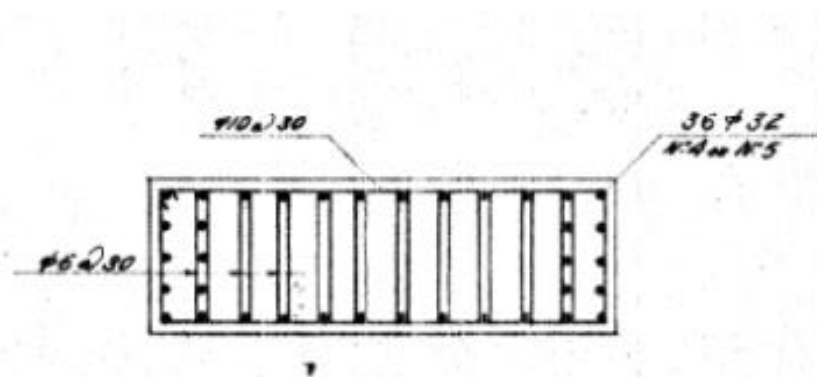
Reinforcing steel specified at the apex of the Arch from the original drawings (Darr el Handasah Consulting Engineers, C317, Revision 2, 1969)
